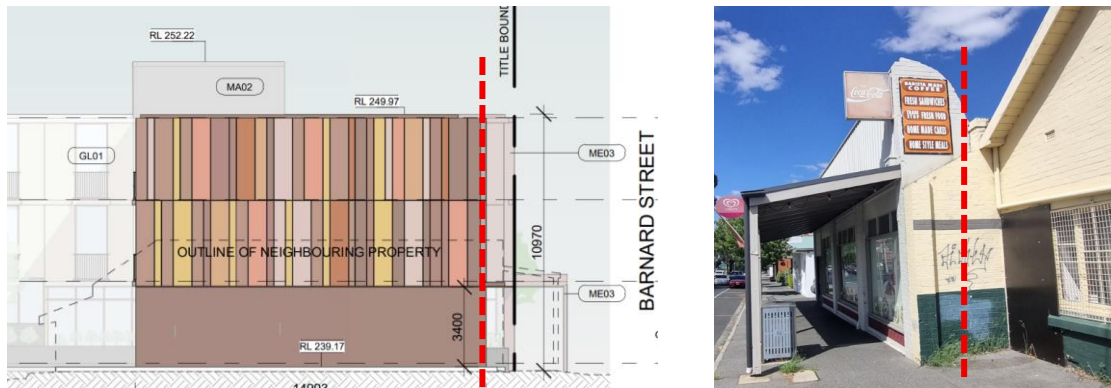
Eastern section of the building set back behind the verandah and portion of curved parapet of the existing building at 247-249 Barnard Street (indicated with red line), which is similar to the siting of the existing building. Source: Life Architecture annotated by Trethowan Heritage.
